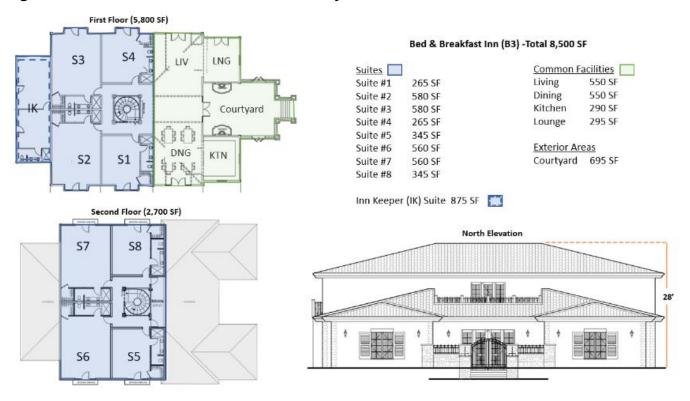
B&B Inn Floor Plan, Elevation & Summary
